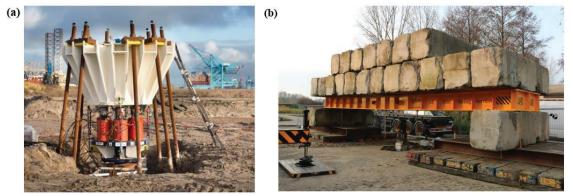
Load test frame (a) with grout reaction anchors (b) with kentledge
